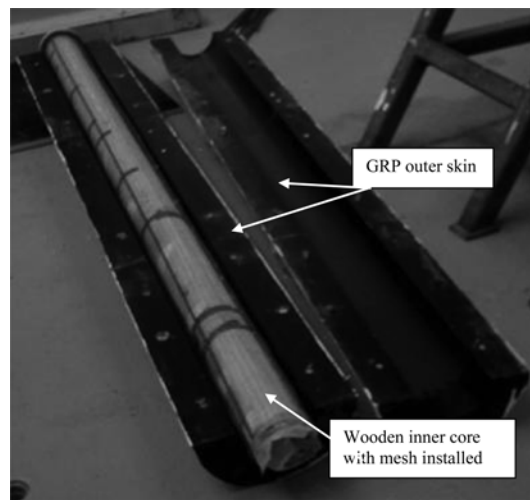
Inner wooden mould with wire mesh installed and outer GRP mould
